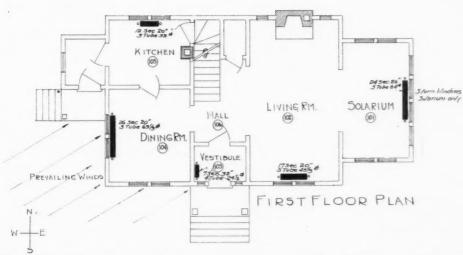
First floor plan showing rooms owner wants conditioned, location and size of radiators, hard-to-heat rooms, prevailing winds and exposures.
